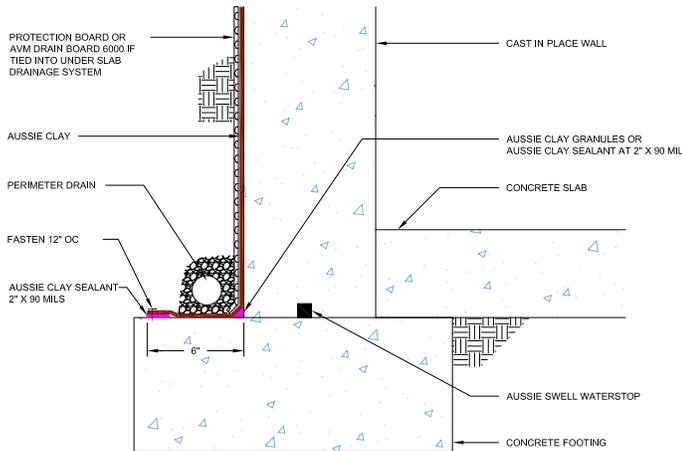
BOTTOM OF THE WALL WITH FOOTING
